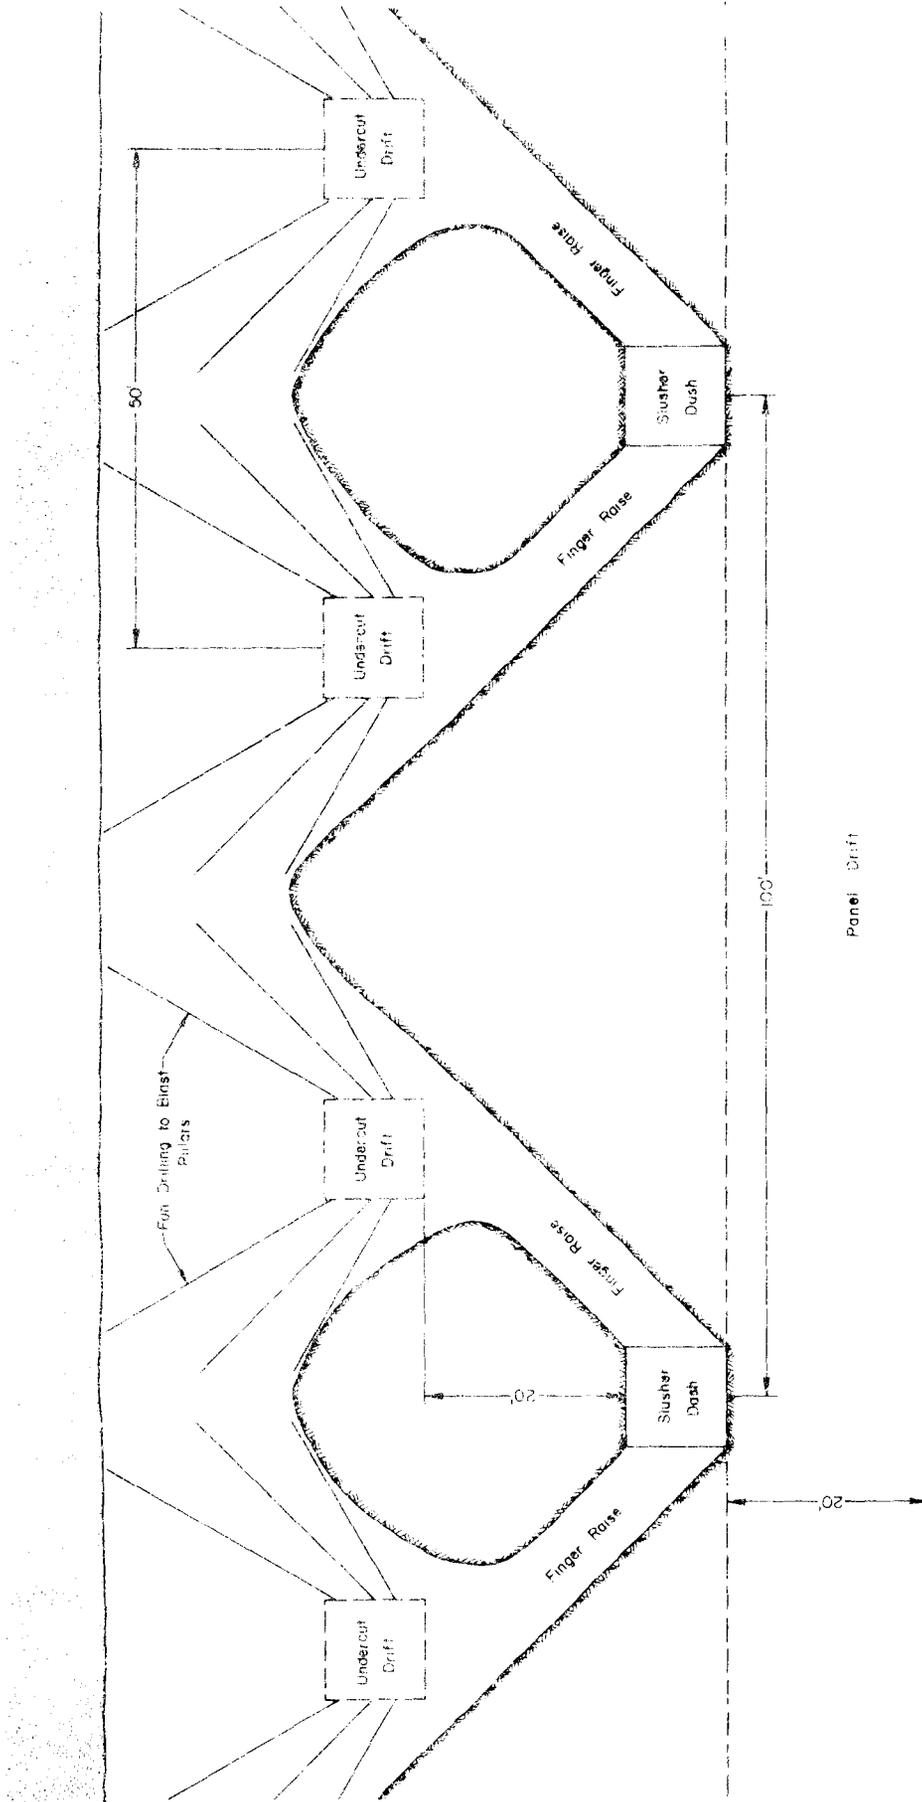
Vertical Section Showing Haulage Drift, Slusher Lines, Finger Raises and Undercut Drifts, Block Caving with Slushers
